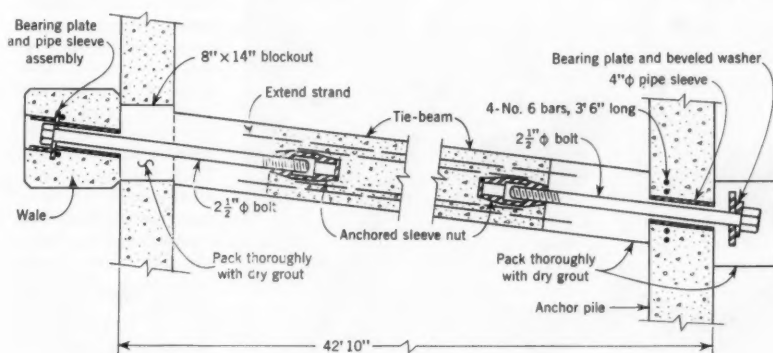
Typical tie-beam connection to wale and to anchor pile. Sheetpile reinforcing is omitted.
